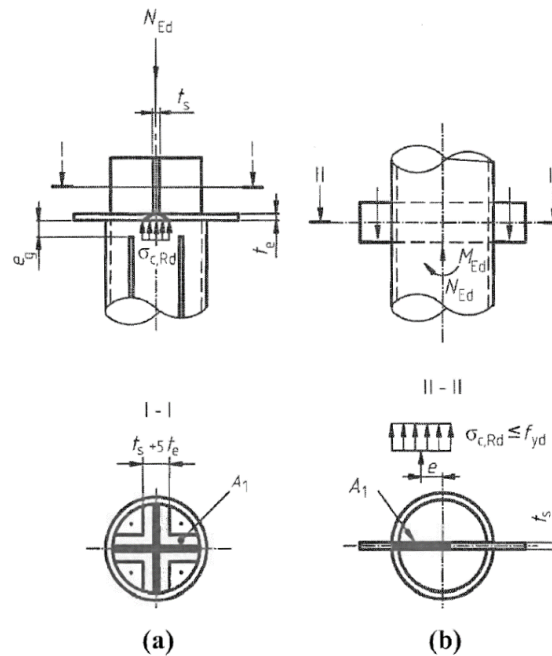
Concrete Filled Circular Tube Section Partially Loaded
